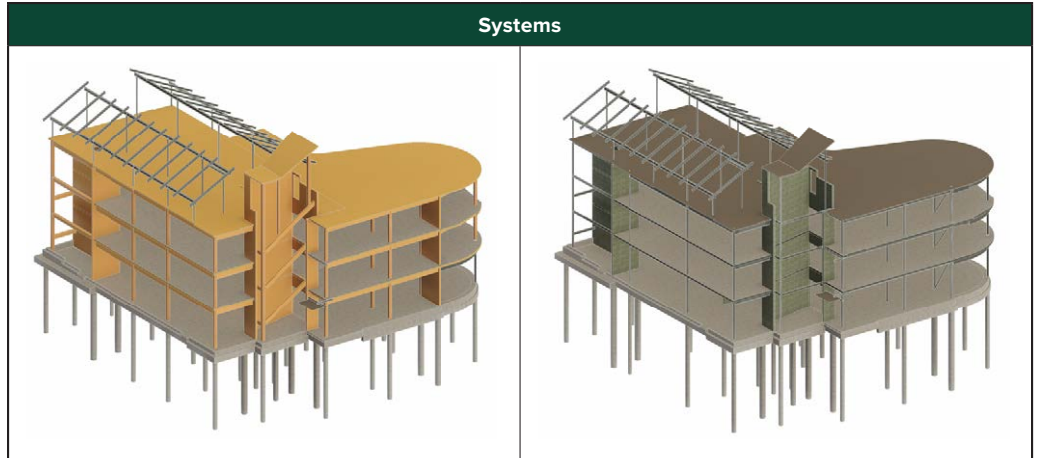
Floor assemblies for the Burwell Center building system alternatives
